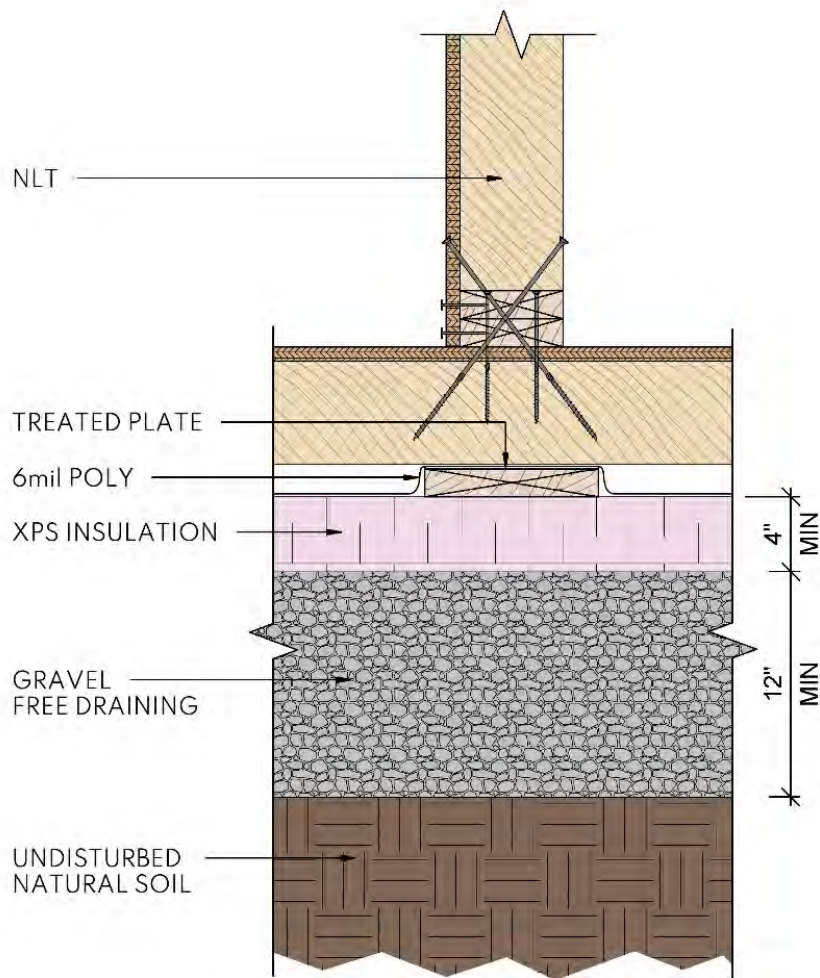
MT NLT Slab and wall interior load-bearing wall detail for Slab on Grade (SOG) Buildings.
